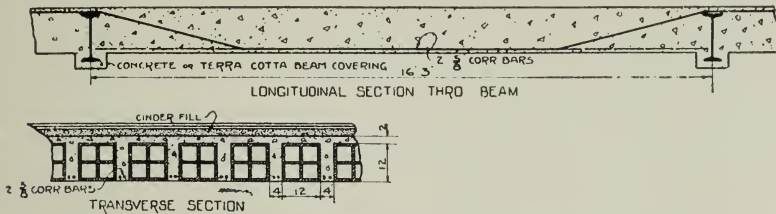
Combined I-beam, Hollow Tile and Reinforced Concrete System.
